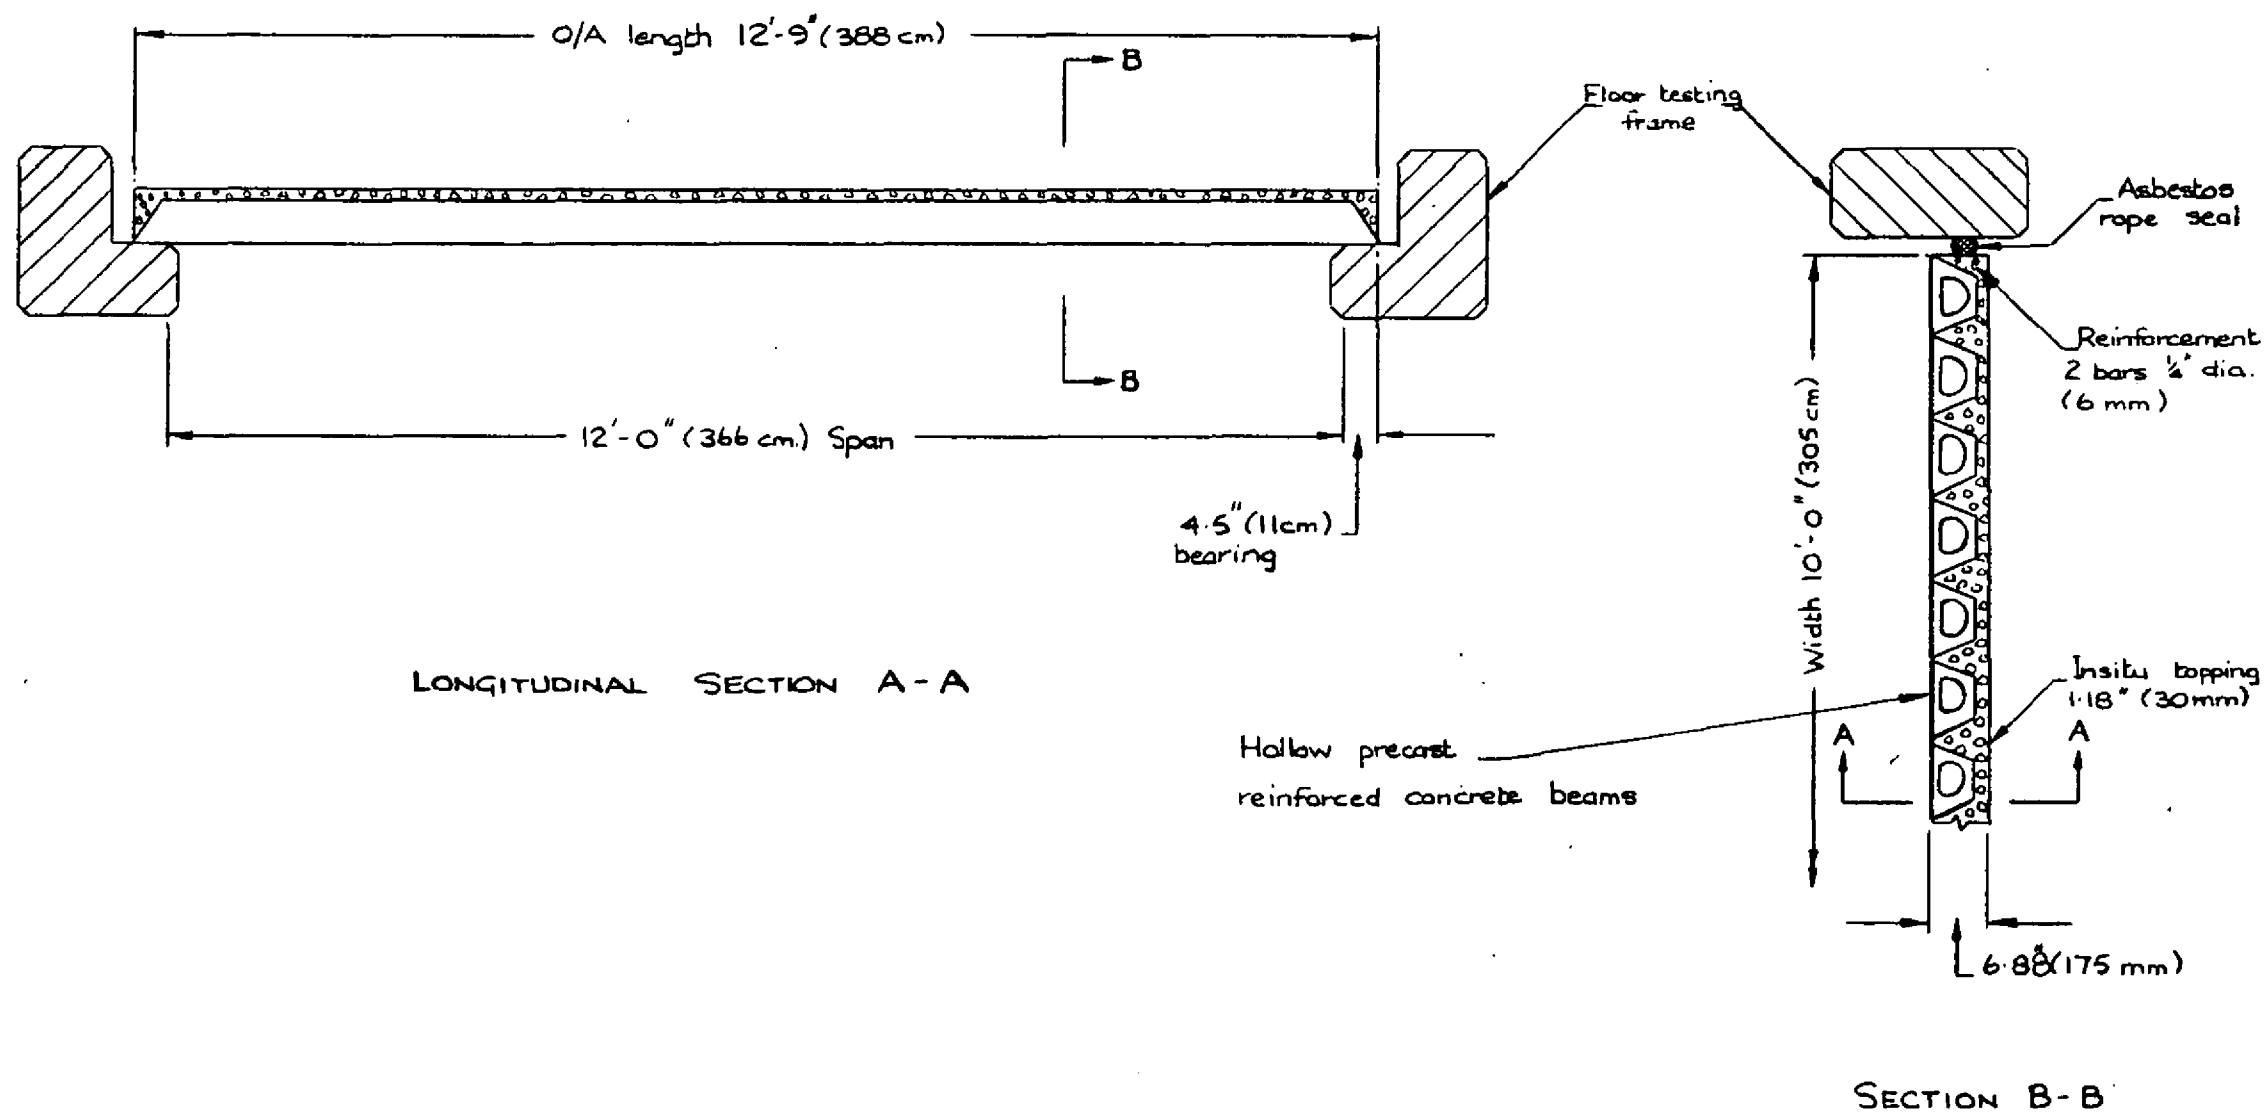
SPECIMEN No 1. SIMPLY SUPPORTED CONCRETE FLOOR
